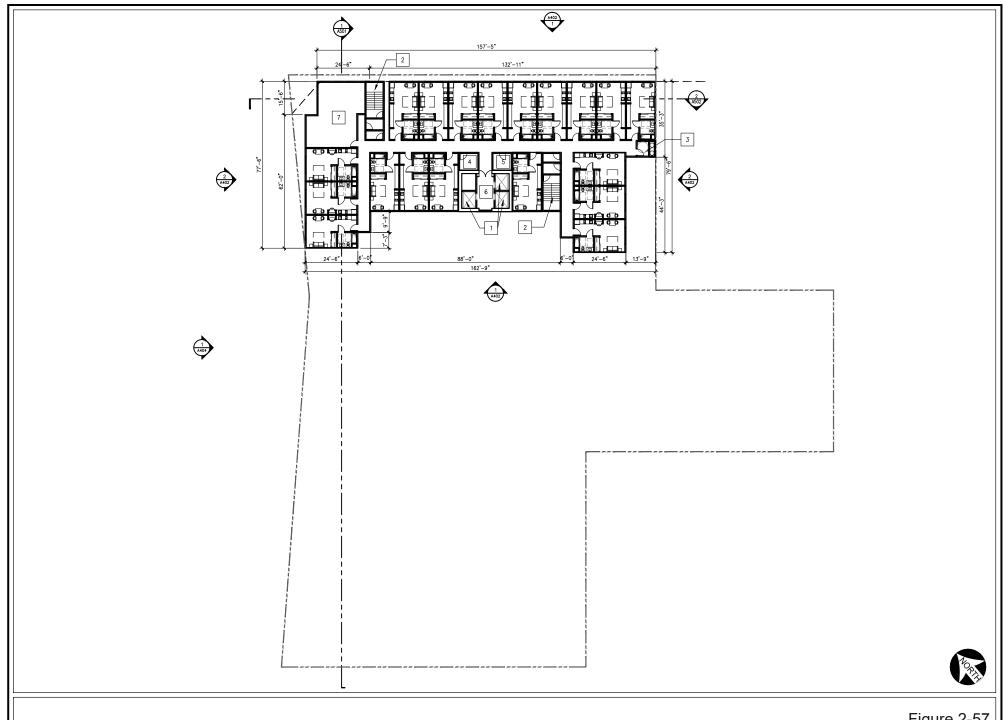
Level 15 and 16 Floor Plan - Site 2
